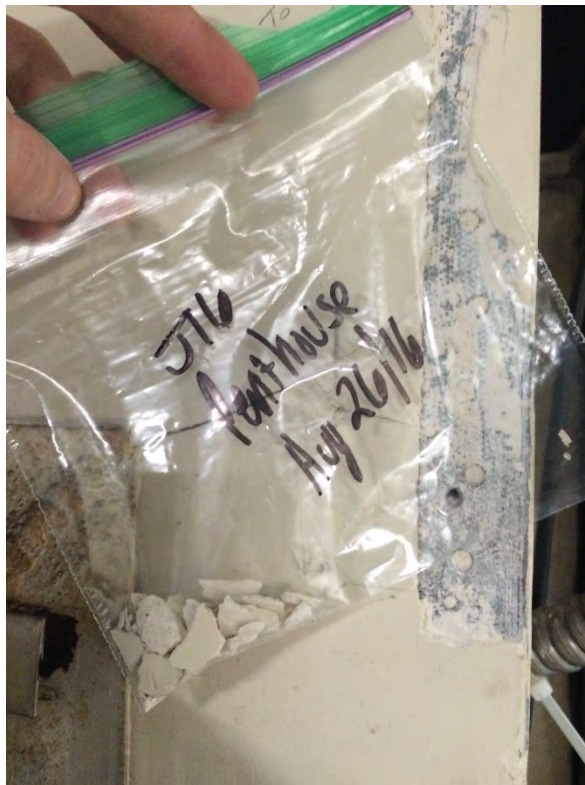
Asbestos sample A37, drywall joint compound collected from wall of penthouse in Pod J16. No asbestos detected.
